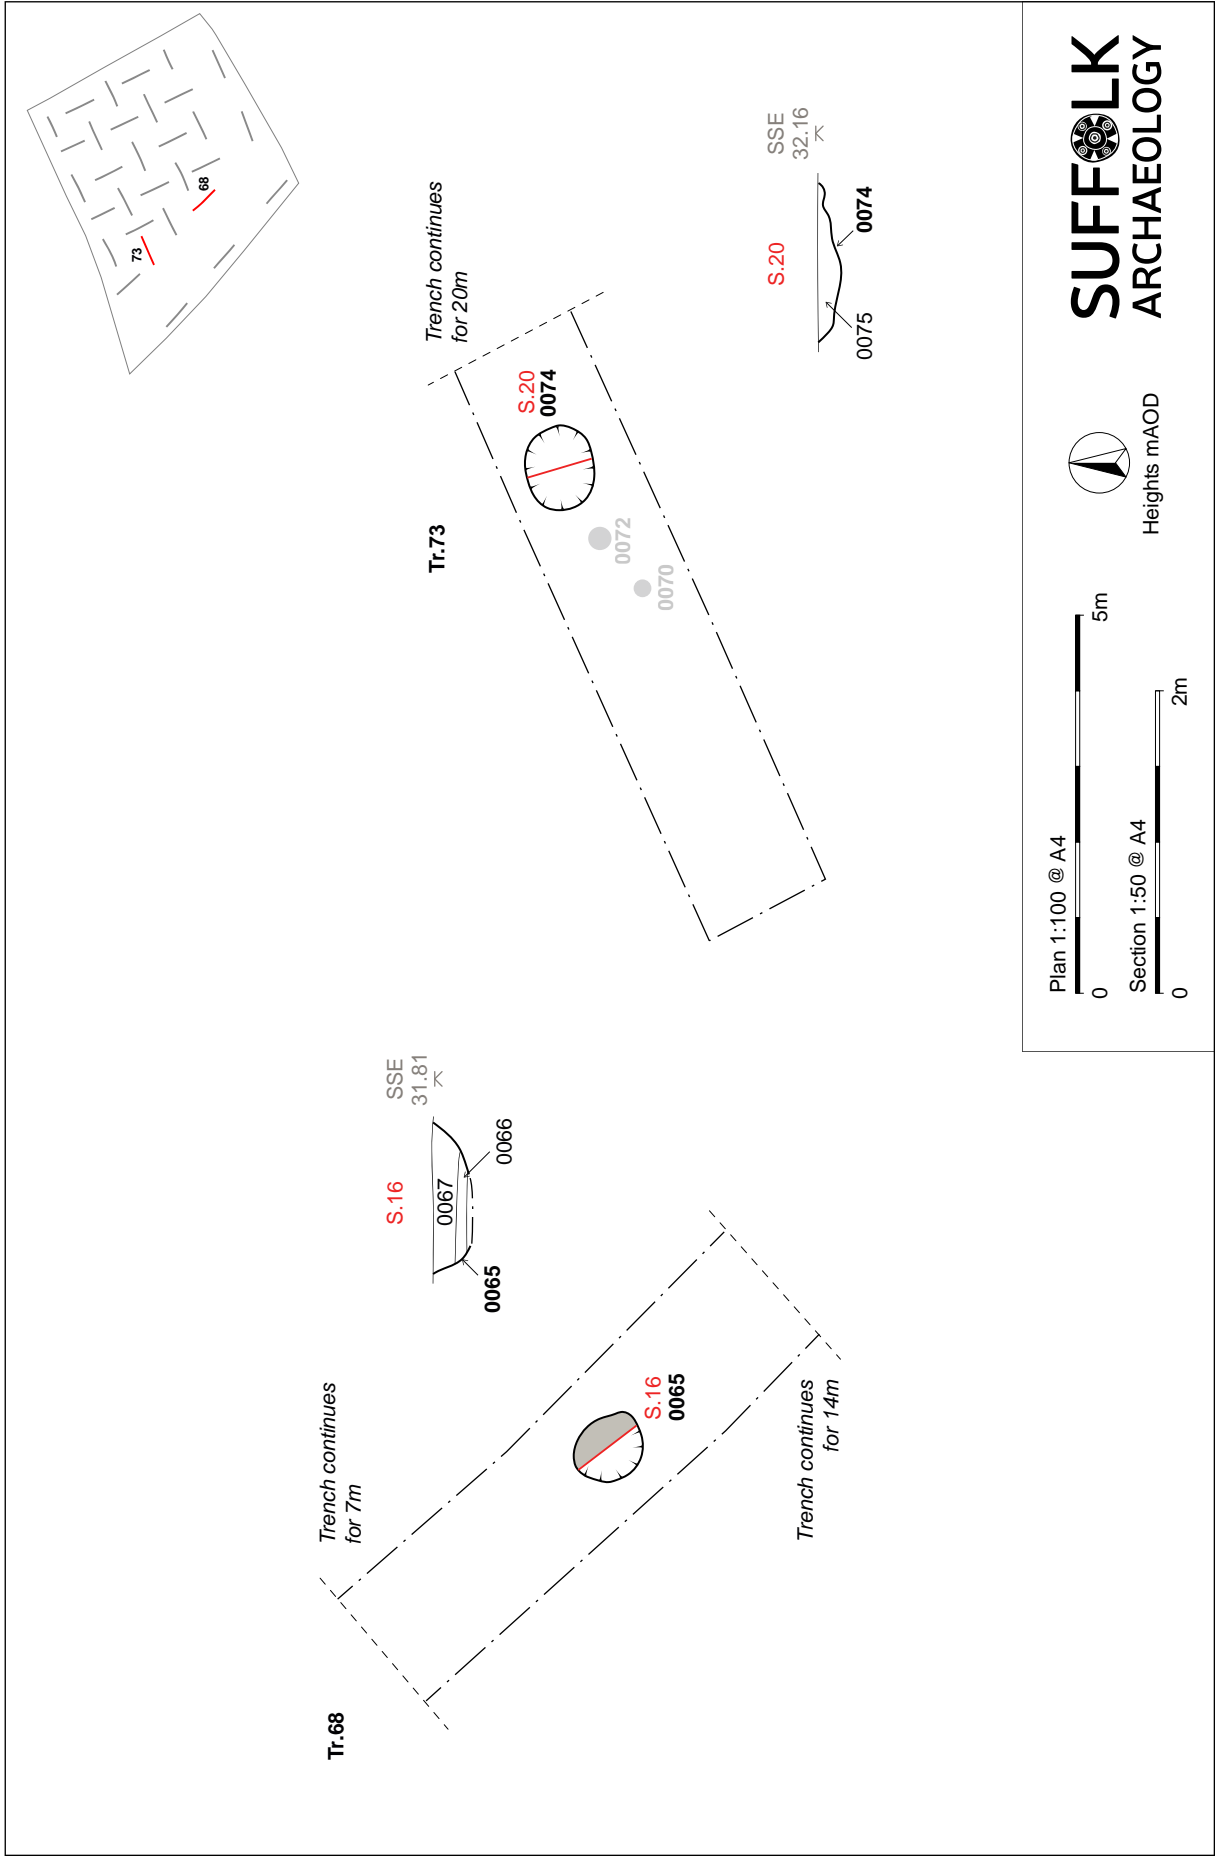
Trenches 68 and 73, plans and feature sections of C14 dated pits
